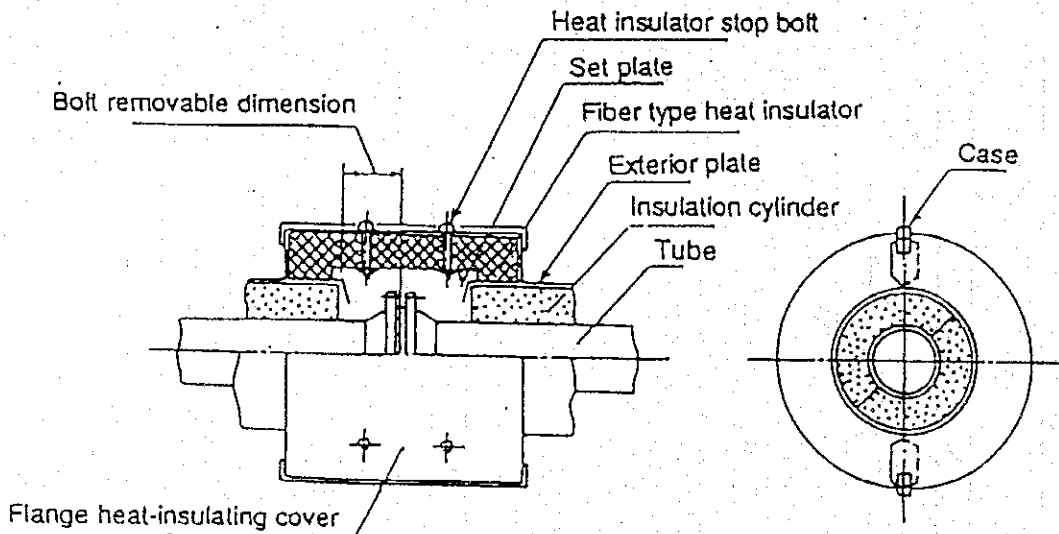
Standard Drawing of Thermal Insulation for Valves and Flanges
